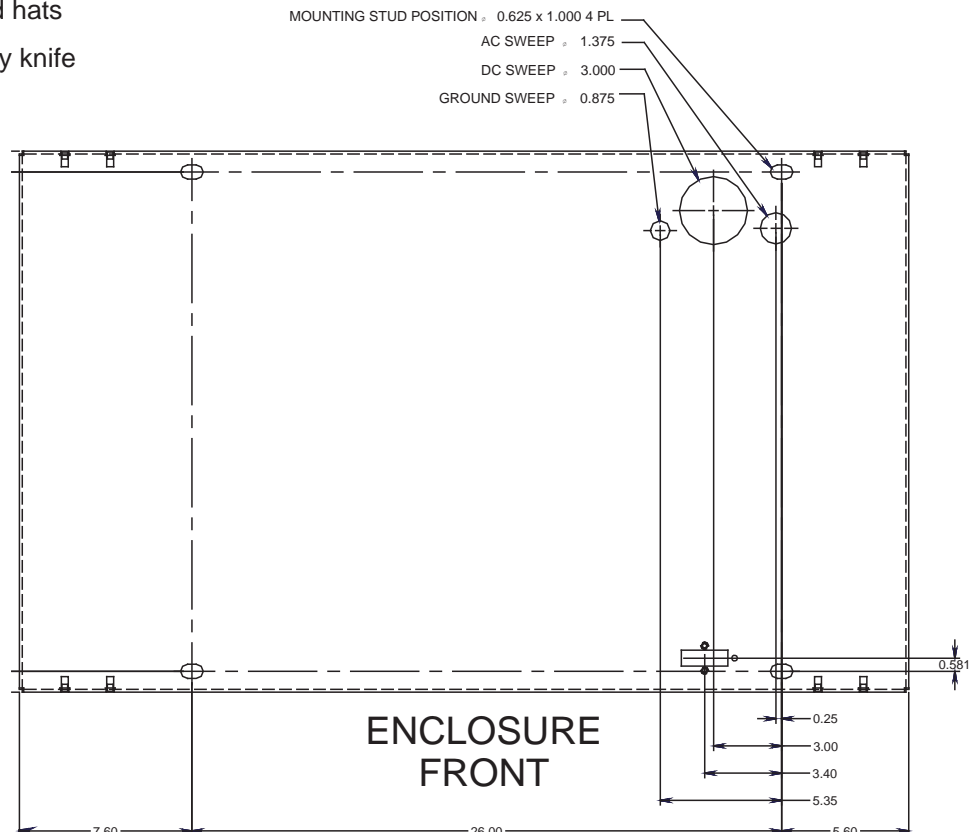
, PN-6x-T 7.5kW Sweep Dimensions (in inches)
